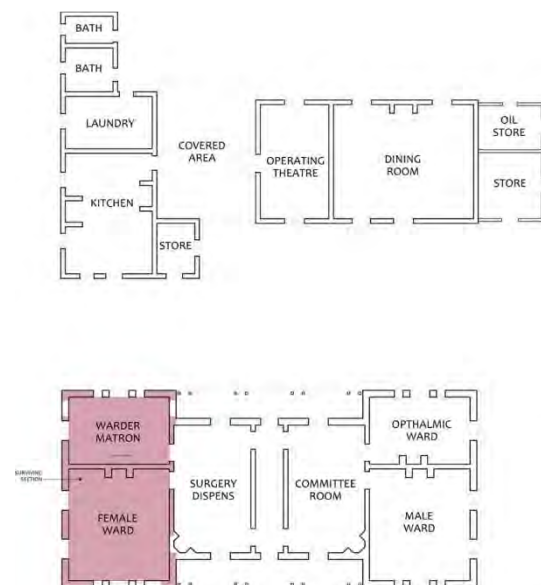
Layout of 1870-1874 outbuilding additions to original hospital based on 1913 plan. Dubbo Health Service Archives
